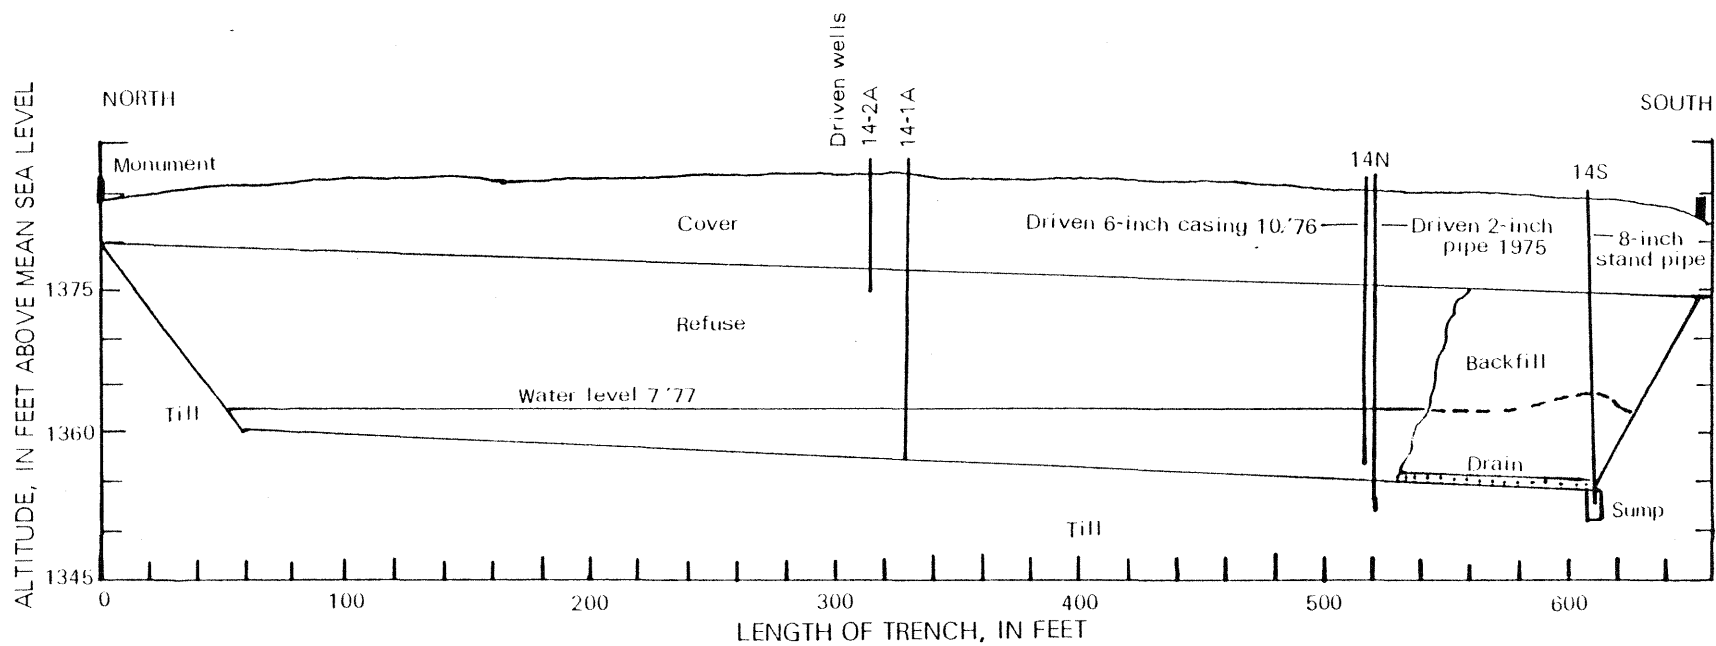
Longitudinal section of south trench 14. (Location of trench is shown in figure 1.)
